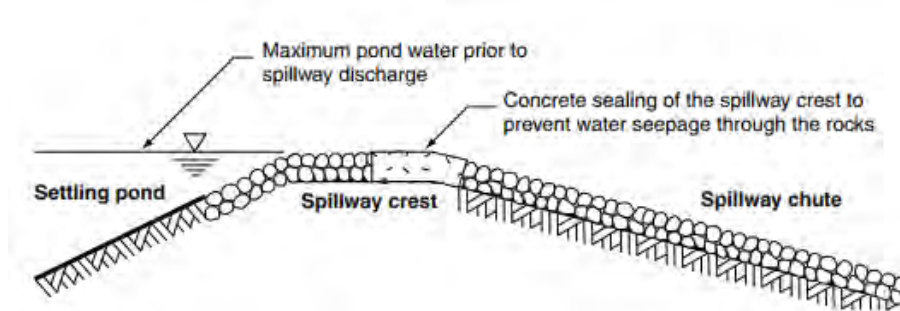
Typical emergency spillway, from Standard Drawing ES-1 (IECA 2008)
